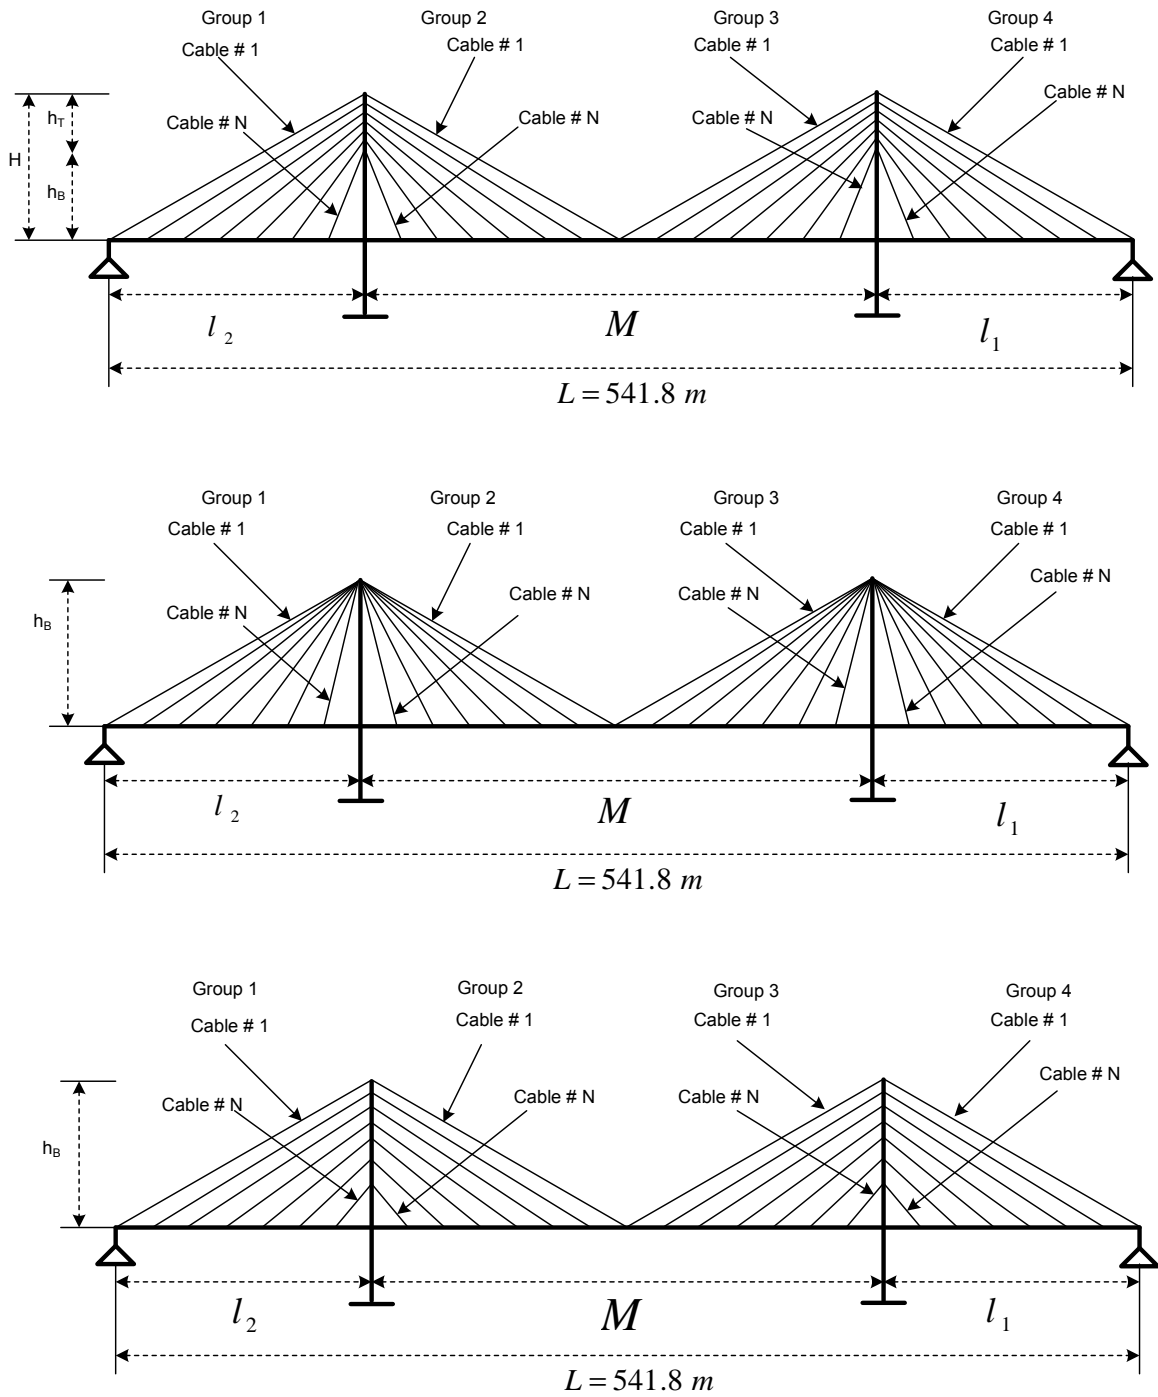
Geometry of three arrangement of cable-stayed bridges
